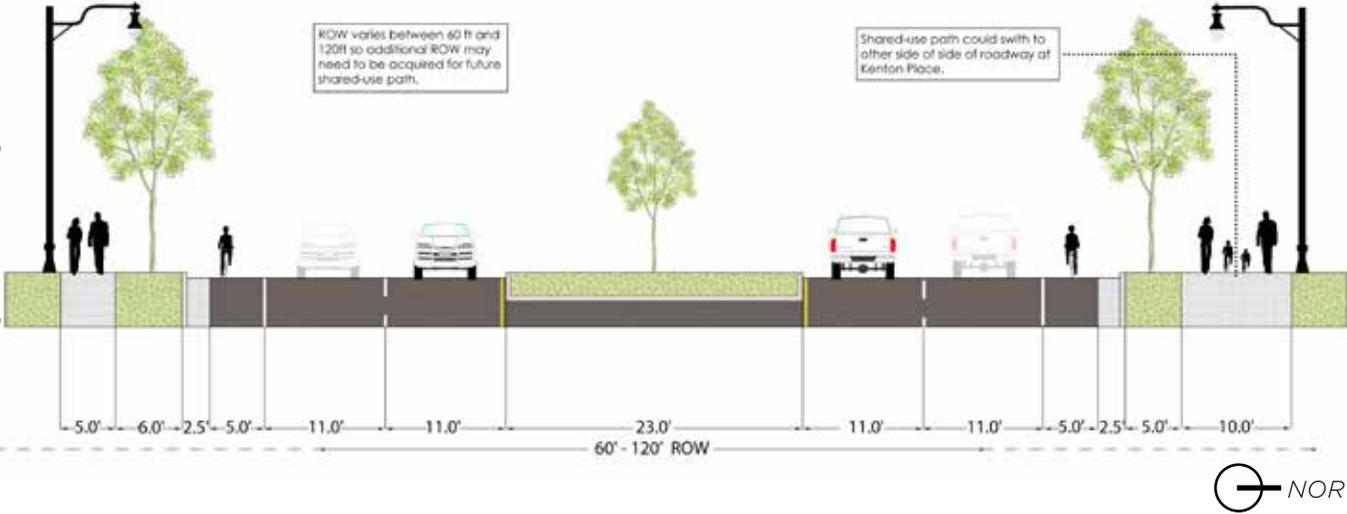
Westmoreland Road existing undivided 2-lane road with Turning Lane and proposed Reconfiguration Concept with Sidepath, Sidewalk, and Bike Lanes
